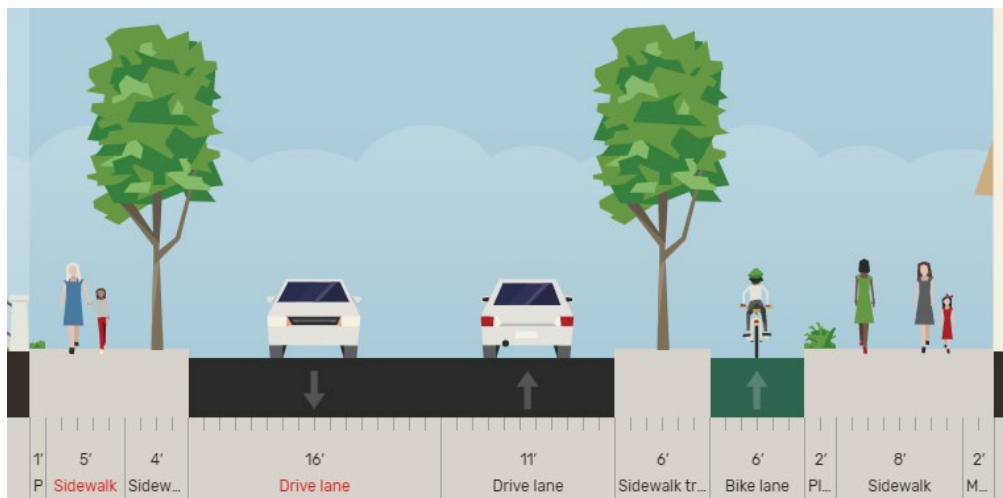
Ultimate Hillcrest Avenue Cross Section
